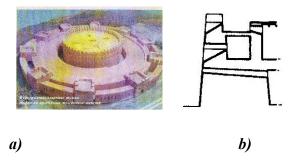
The mold of the "cast fort" (a) and the wall section (b)
